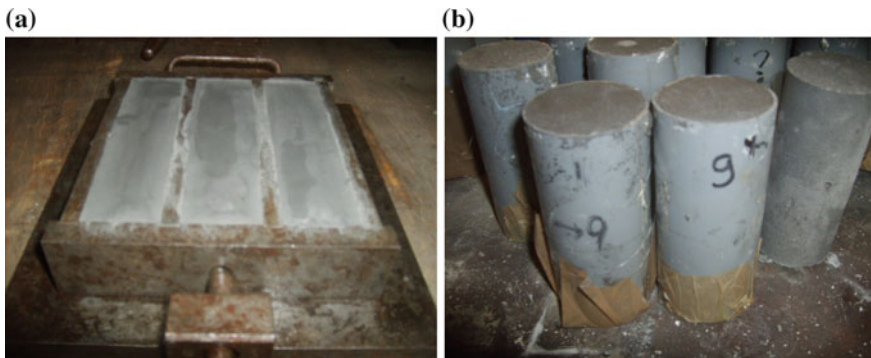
Mortar test specimens: a prismatic samples; b cylindrical samples
